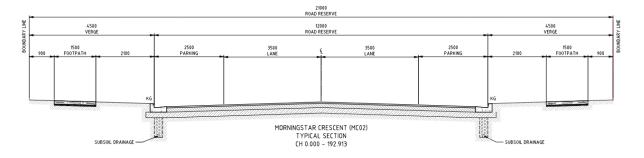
Morningstar Crescent proposed cross section (eastern side of site)
